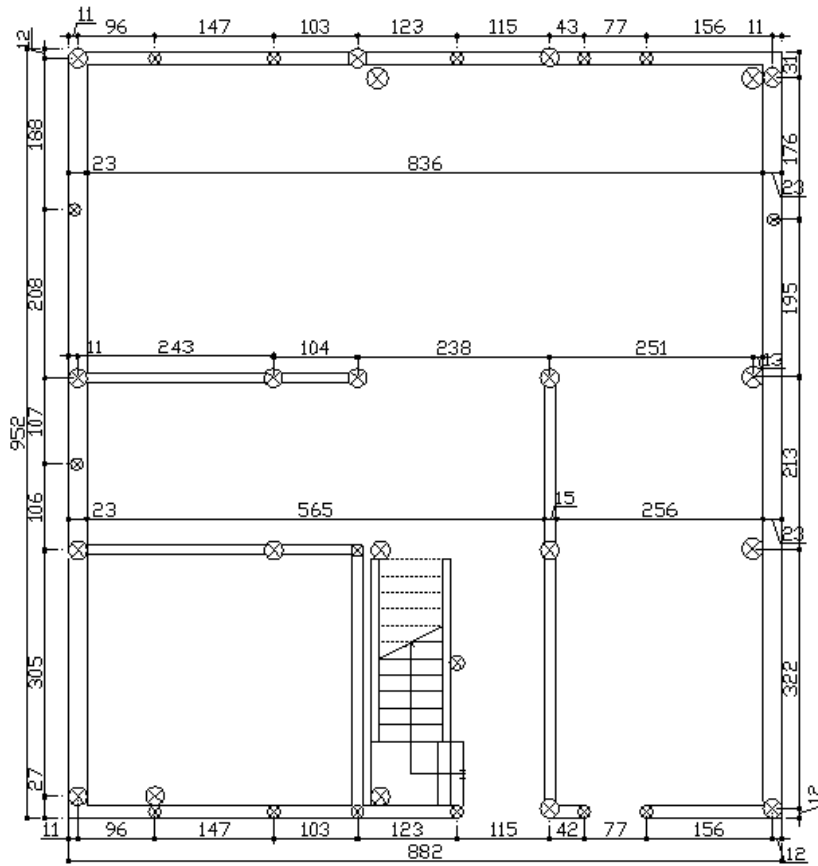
First floor plan of a traditional timber framed building in Yuva village (House 1).
